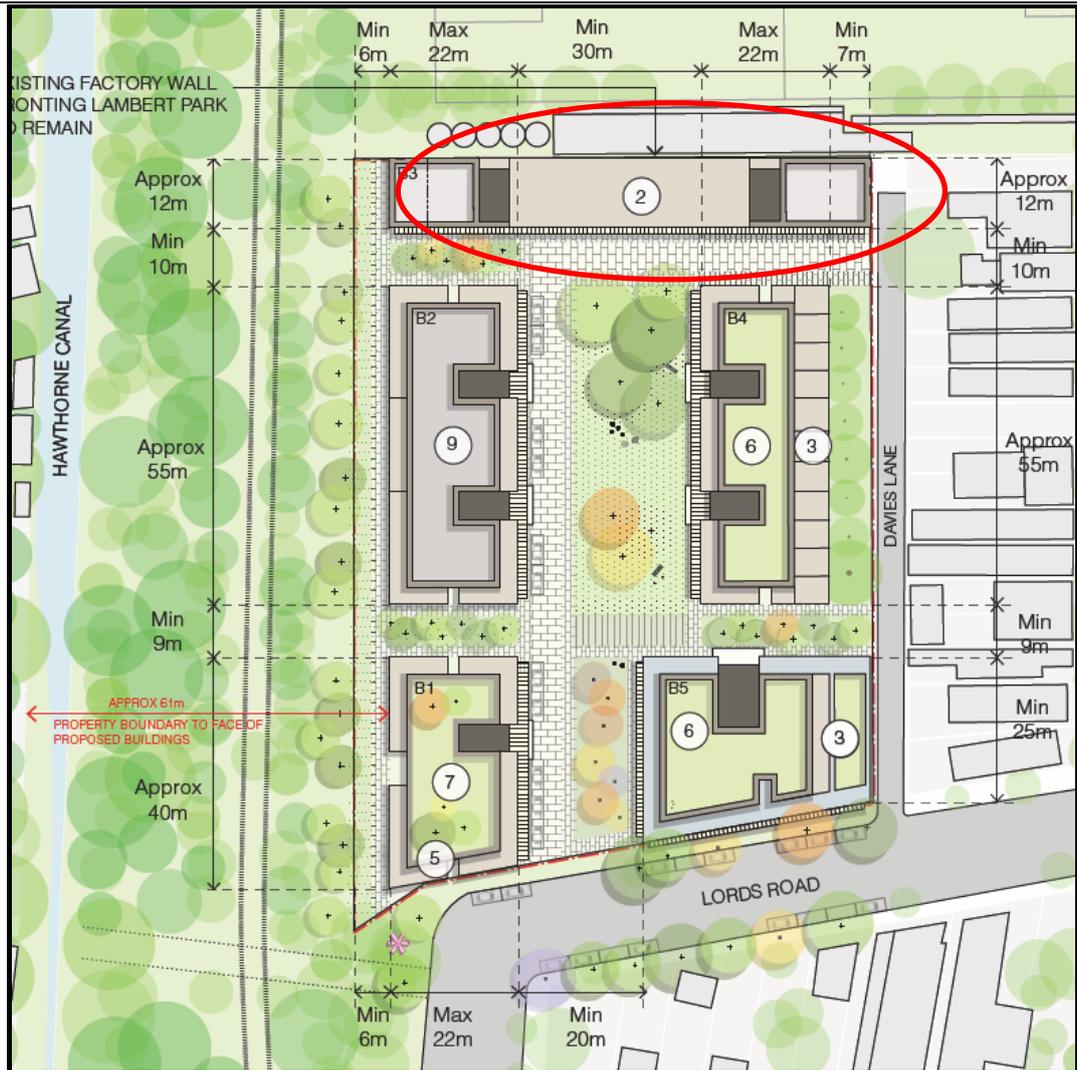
Proposed building heights and setbacks (Source: UDR, page 20)
